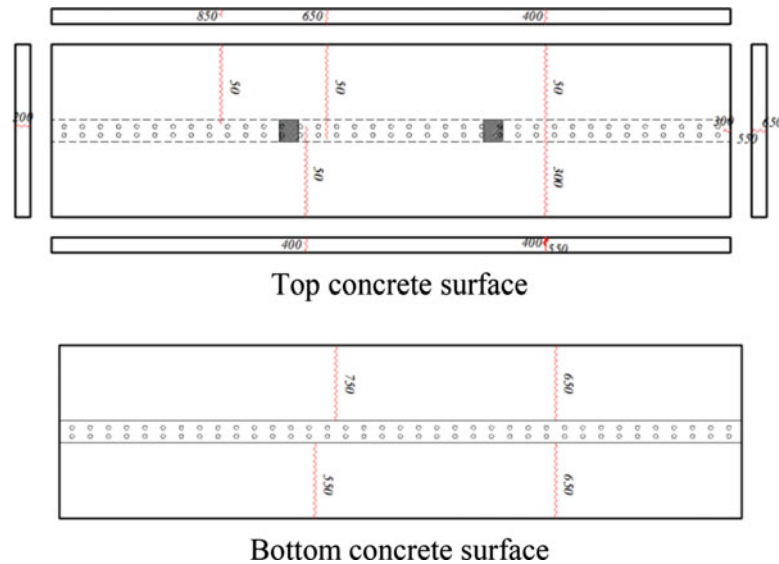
Crack formation and distribution on the concrete flange for specimen B-1 (Number of cycles in thousands)
